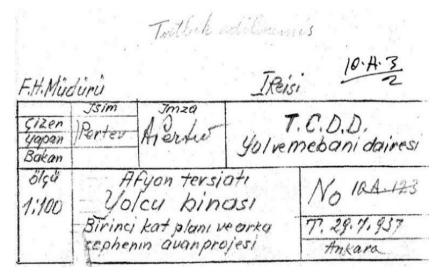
Afyon station project / Title block of first floor plan and back elevation preliminary drawings." Not applied "note above.
